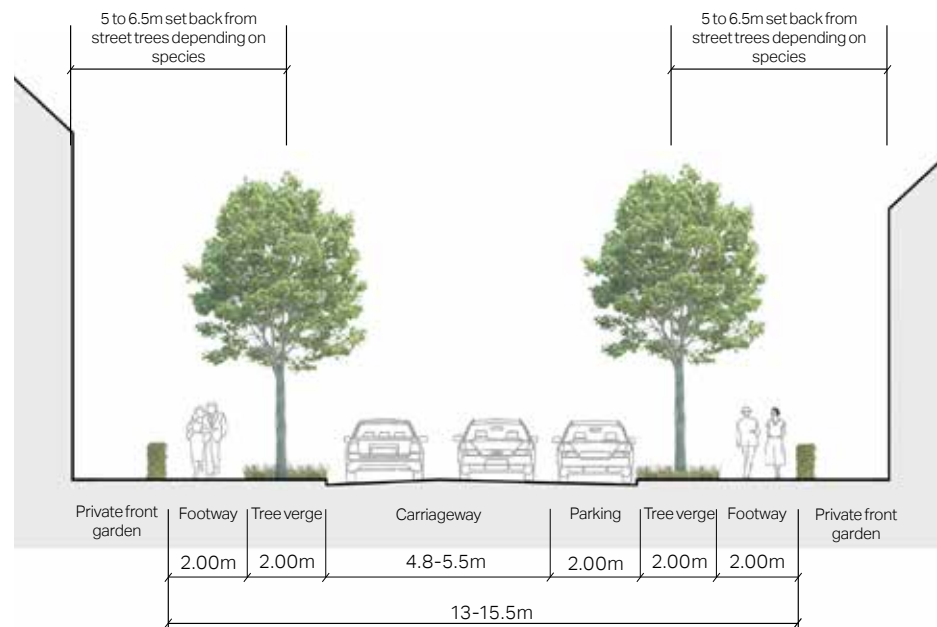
Cross-section to illustrate some dimensions for residential streets 1.
